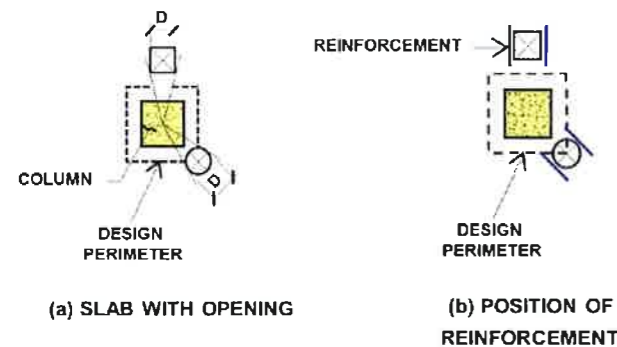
Options for Treatment of Openings (P671)
